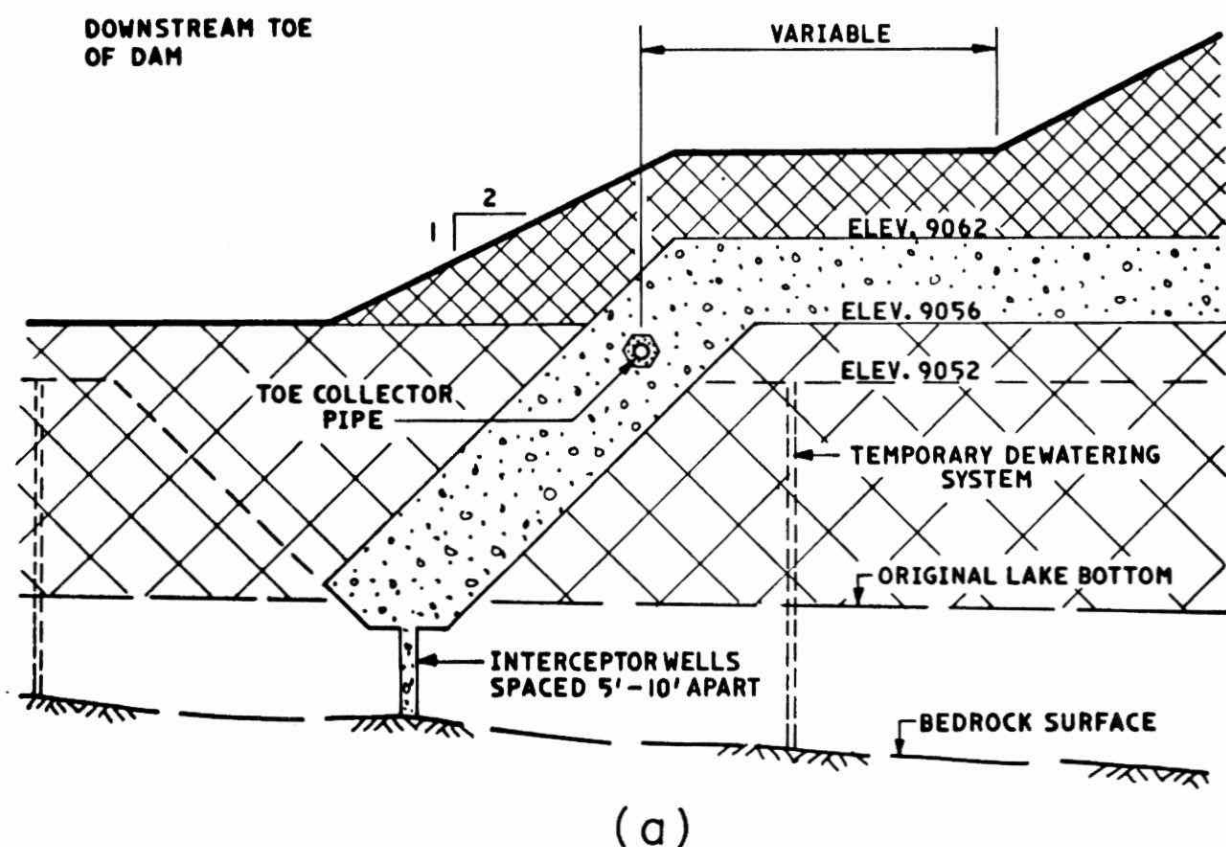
TOE DRAINAGE COLLECTOR SYSTEM, DAM No. 10
